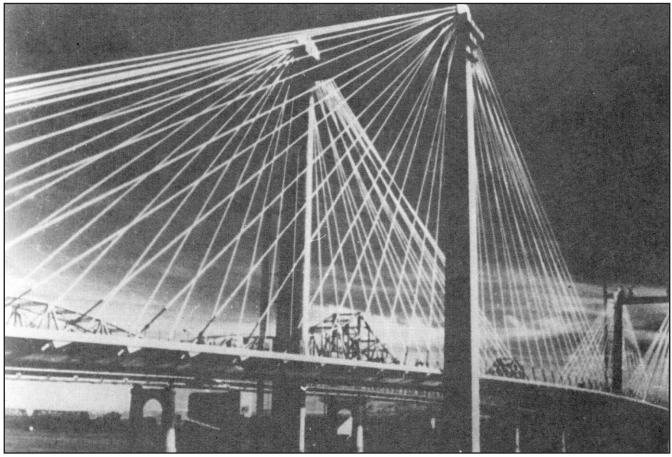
Pasco-Kennewick Bridge across the Columbia River in the USA. It has a central cable-stayed span of 299m, with stayed flanking spans of 124m
